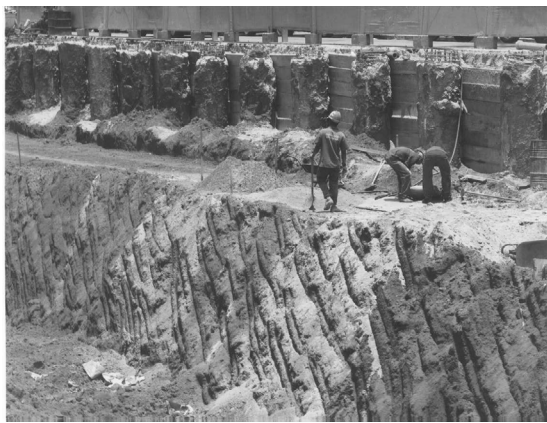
First phase of excavation – detail of wood boards between the half-moons
